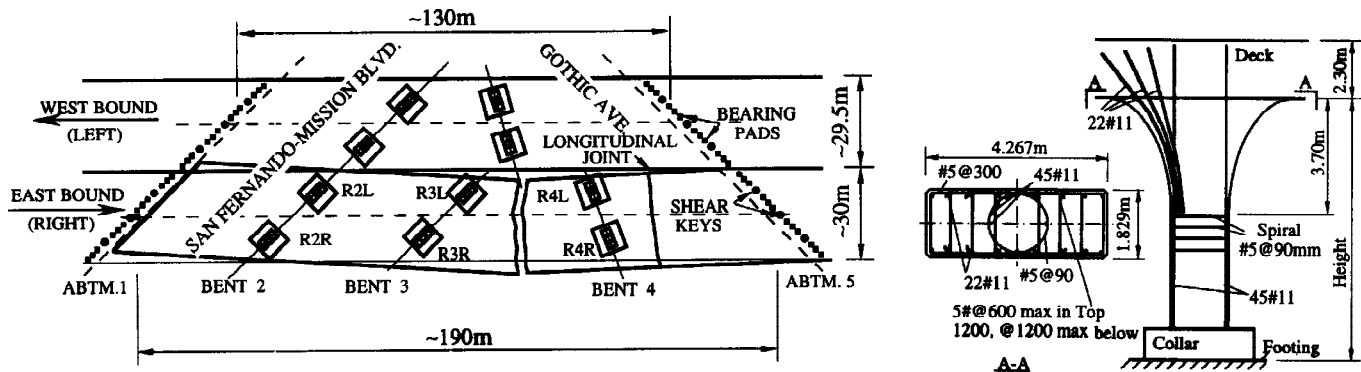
Mission-Gothic Undercrossing and column reinforcement details
